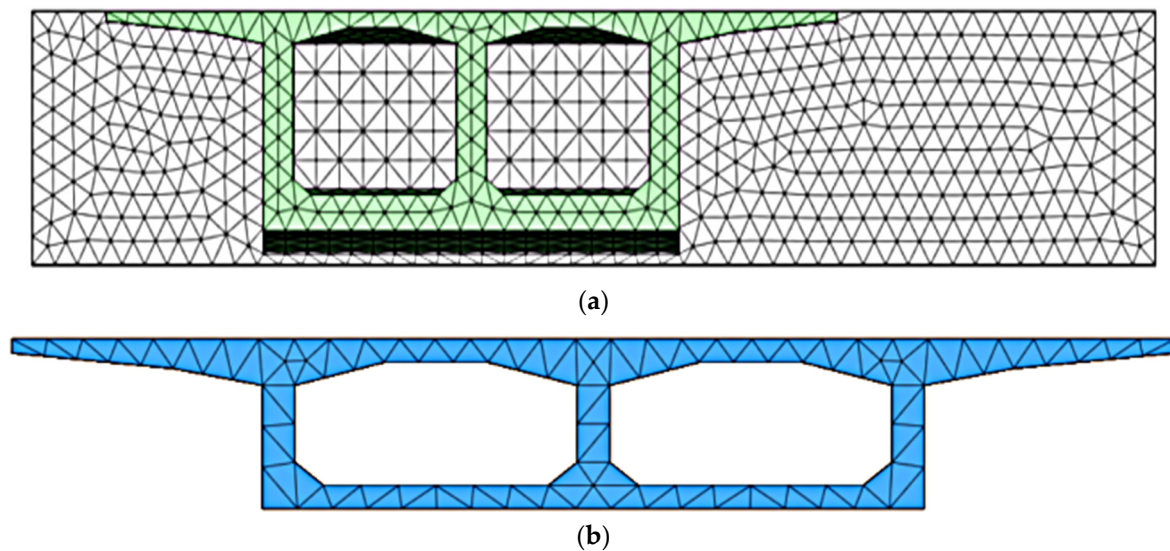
Grid division of key sections of the main girder. (a) Section of pier top. (b) Midspan section.
